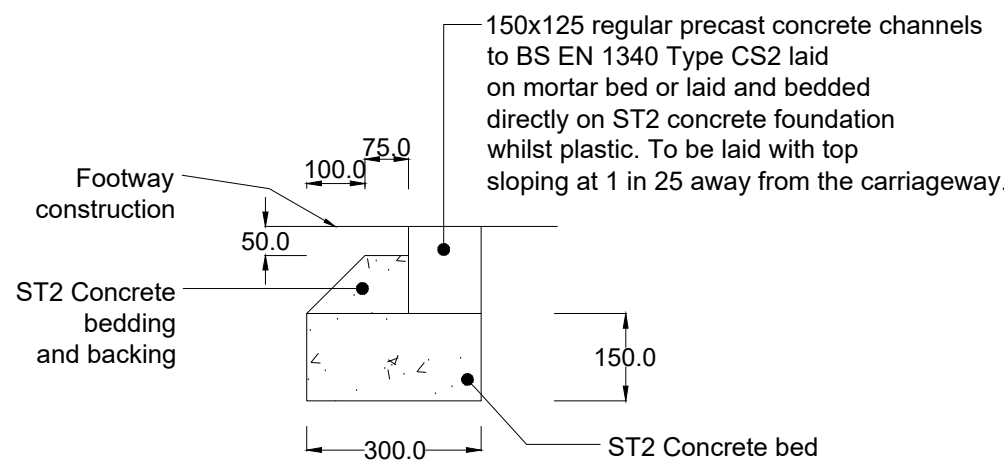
DETAIL OF EDGE CONSTRUCTION AT TIE-IN BETWEEN NEW AND EXISTING CARRIAGEWAY
